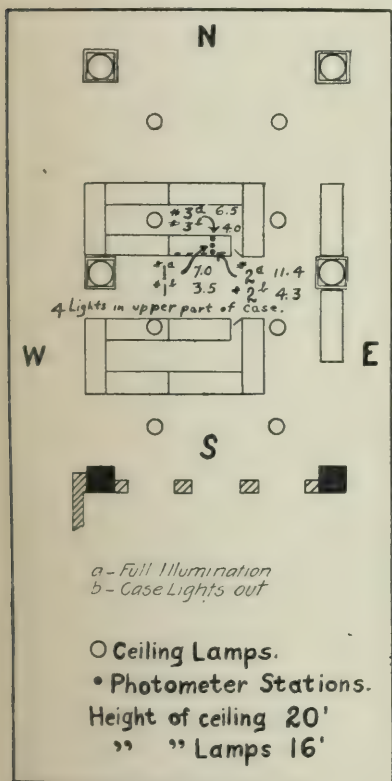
Section plan of main floor, (plated silver ware), showing location of furniture, pillars, lighting units, test stations and illumination data.
